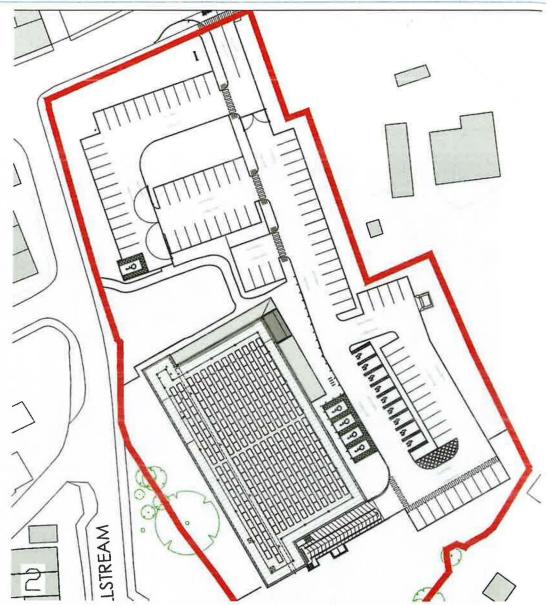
Extract from drawing no. 20984-THPK-32-XX-DR-A-0103 "Proposed Site Plan" showing the proposed site and panel layout.
